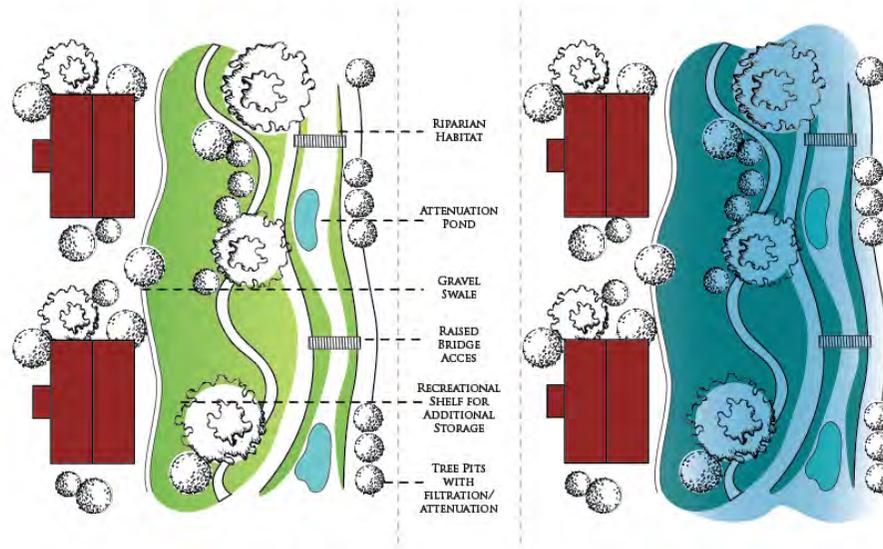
Concept plan of stream corridor and flood storage area (Utilis 2018)
